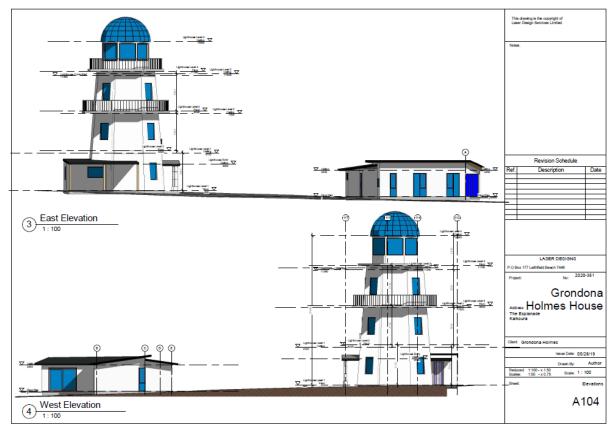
Preliminary design of the two buildings (no foundations detail shown).
